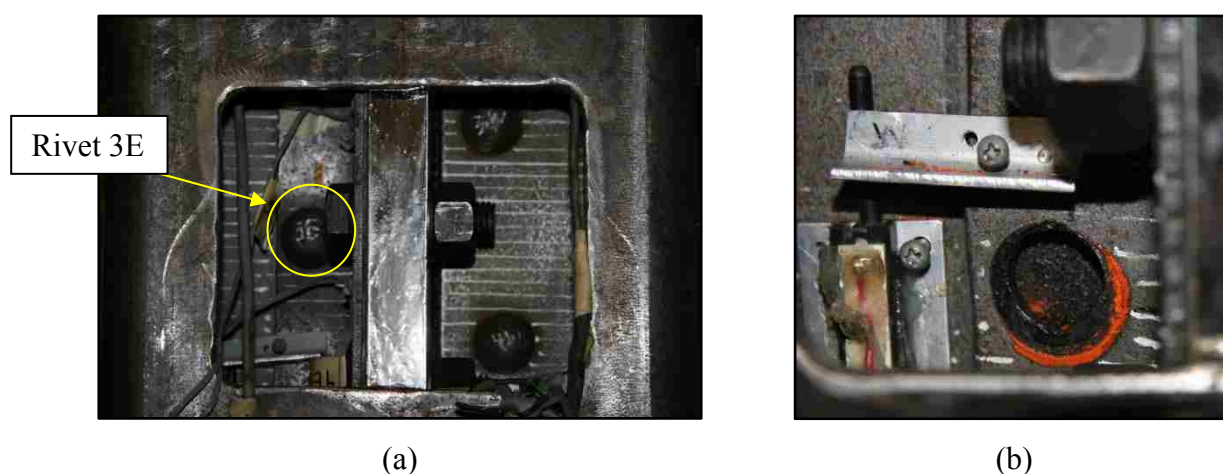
Photo of Fracture of Rivet 3E (a) Rivets Prior to Fracture (b) Rivet 3E Post Fracture
